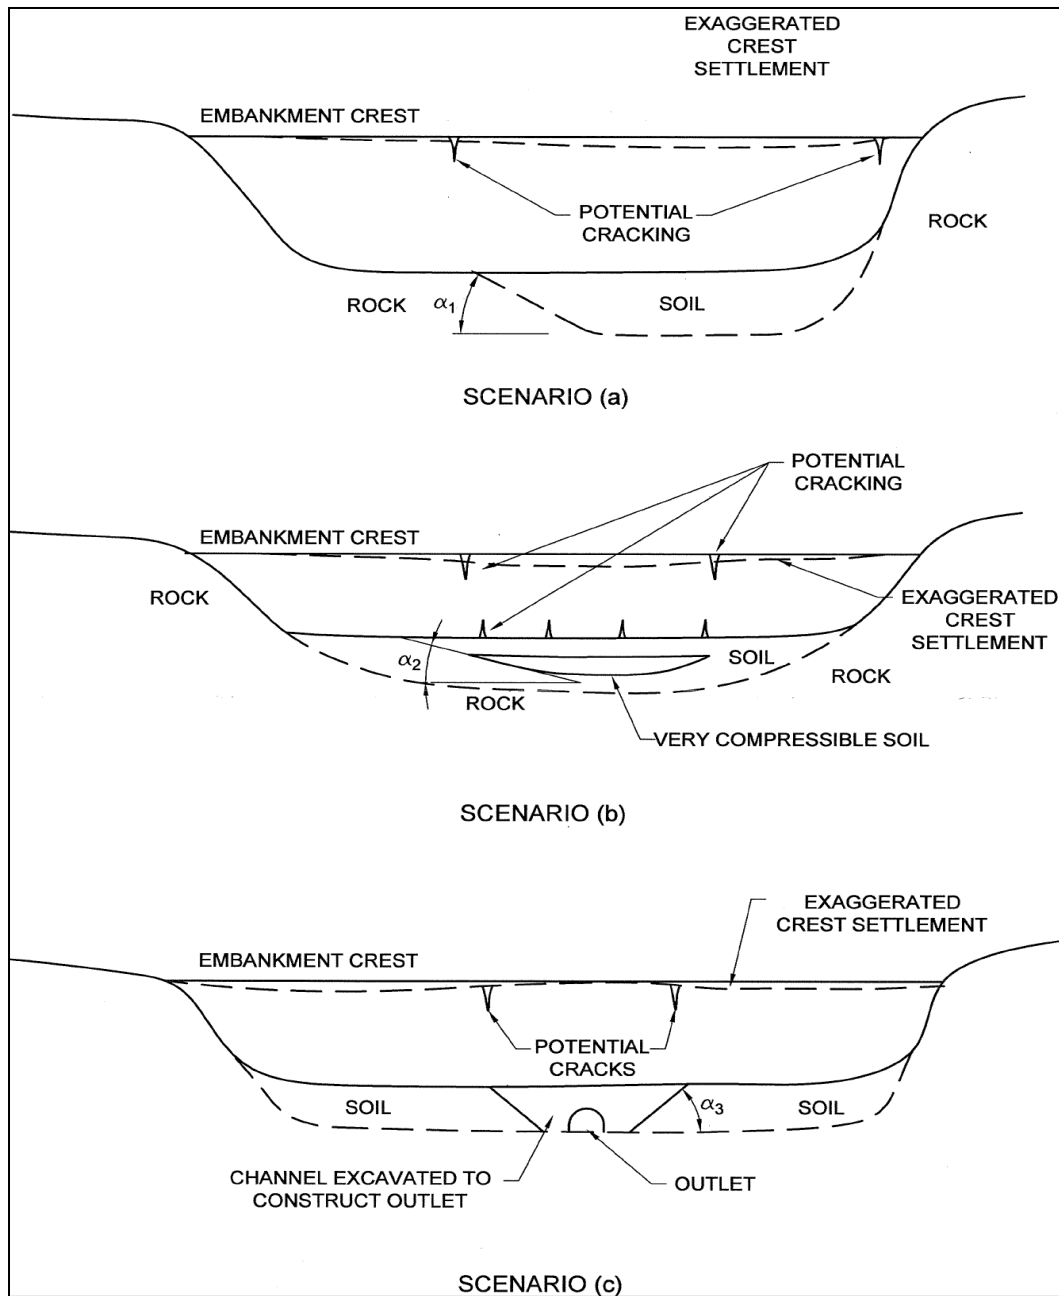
C-5 Cracking and Hydraulic Fracture due to Differential Settlement in the Foundation (Fell et al. 2008)
